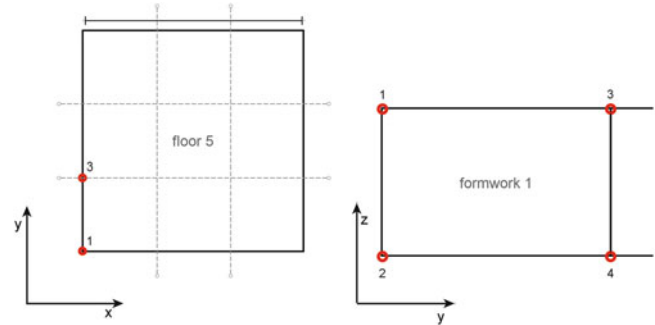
Ground plan (left), vertical section of the formwork (right)
